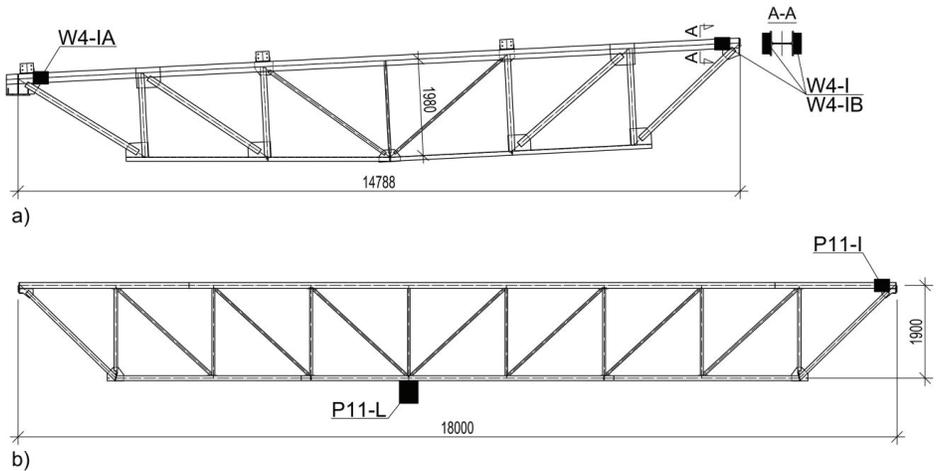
Example of the monitored girder (a) and truss purlin (b)
